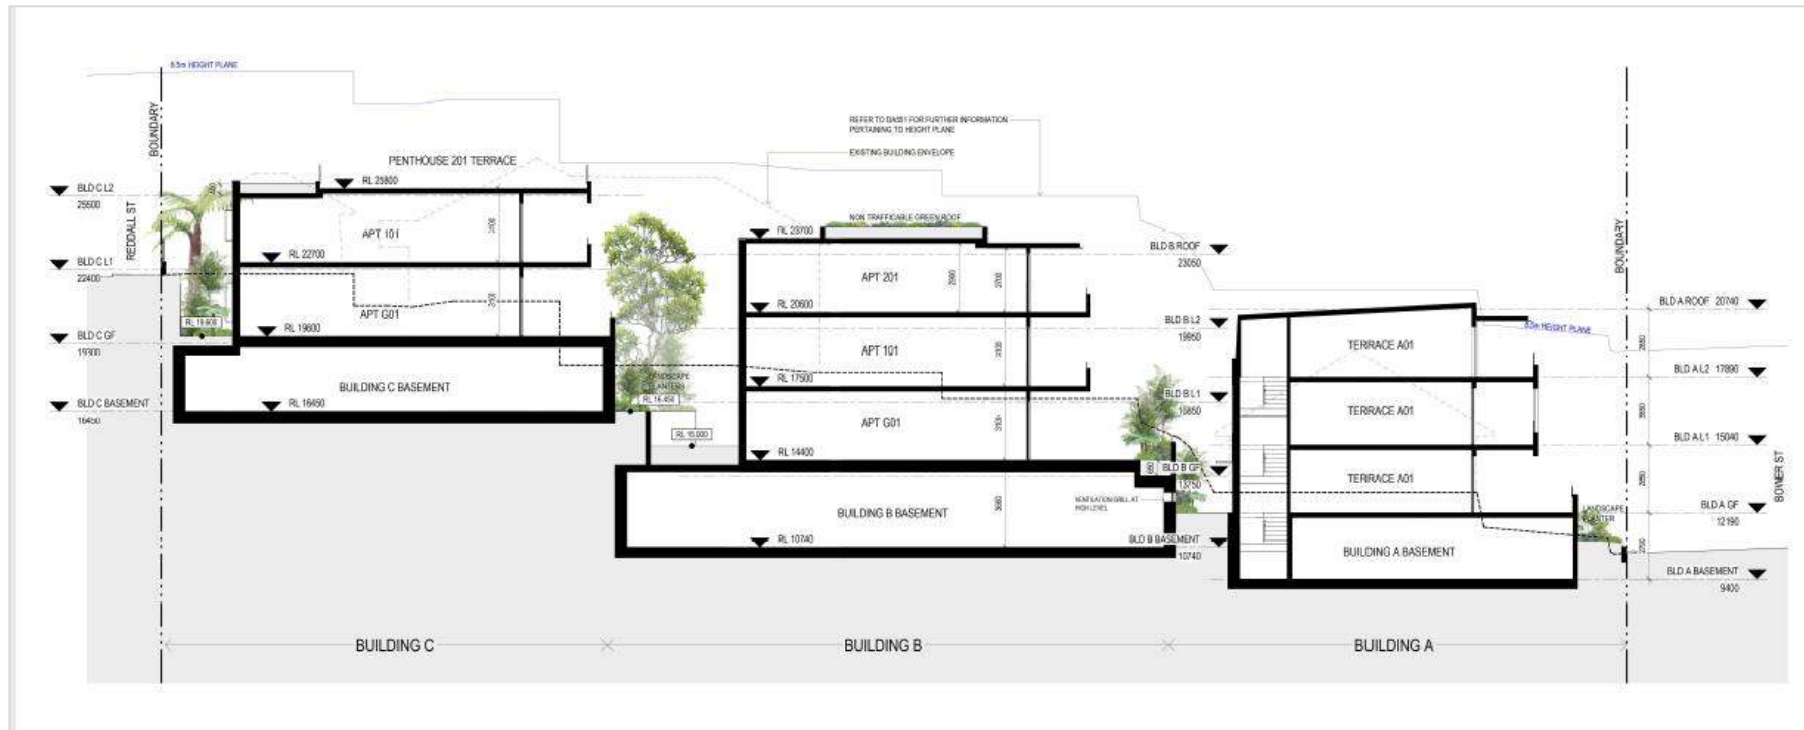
Section Plan B showing the 8.5m height limit in light blue and the portions above the height limit viewed from College Street (Source: Squillace Architects)
